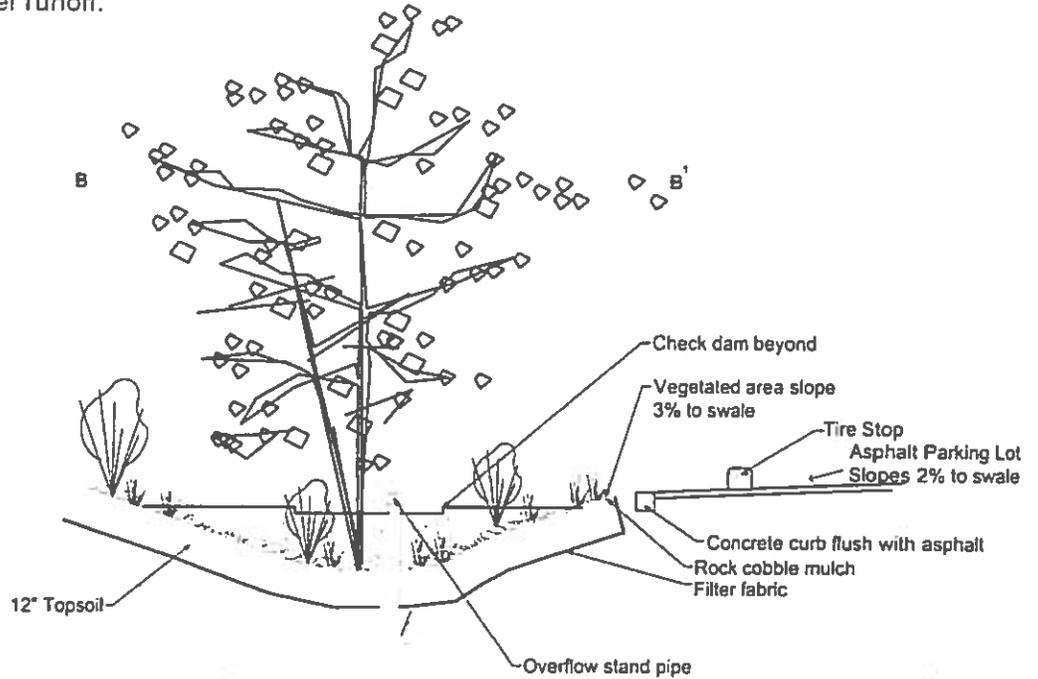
VEGETATED SWALE SECTION (EXAMPLE)
